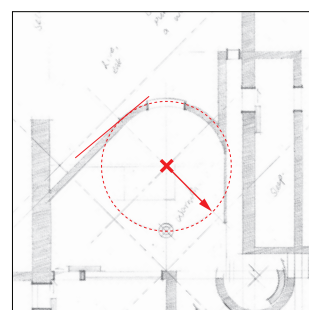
House plan. Red diagram illustrates how circular geometry constructs the its form.
